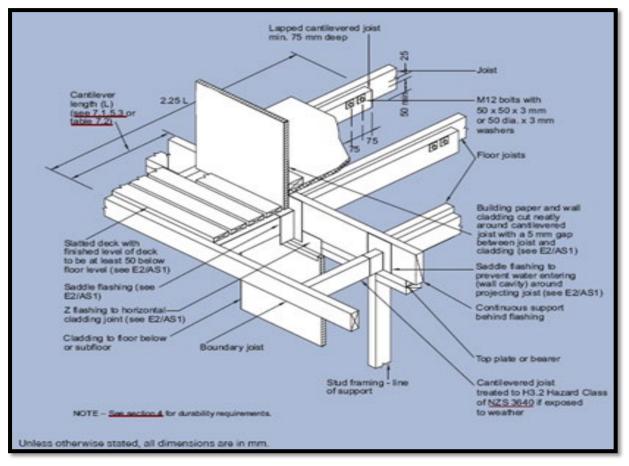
NZS3604:2011 detail for lapped cantilevered joist installation
